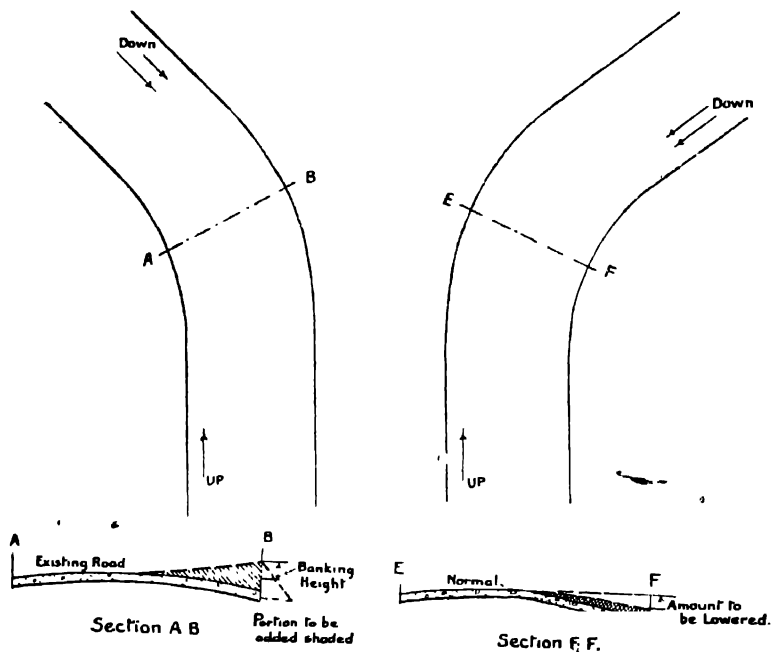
Superelevation of Dangerous Bends on Hill Roads.
